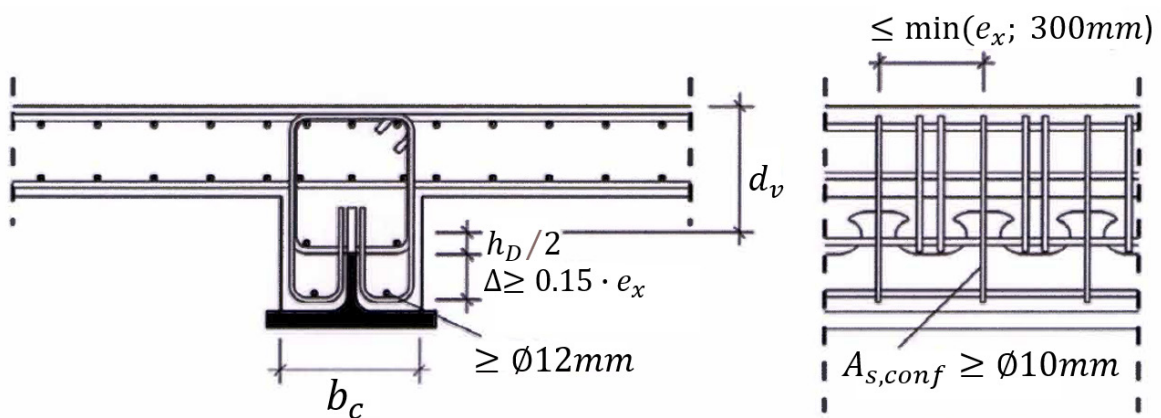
Reinforcement details in composite girder with reinforced concrete web and composite dowels [14].
